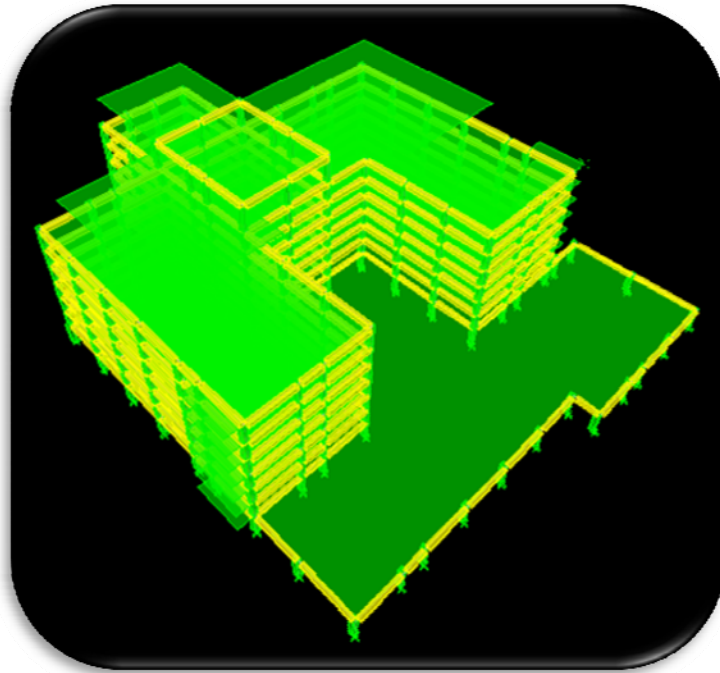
Modified Concrete Moment Frame ETABS 3D Model
